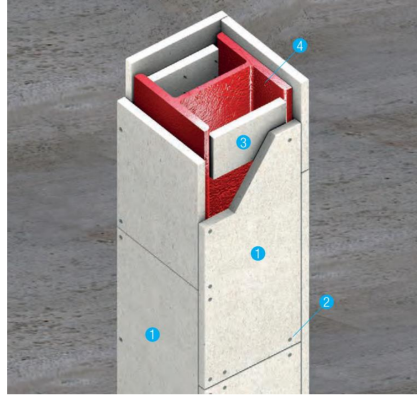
Steel column with PROMATECT®-H and normal joints.
